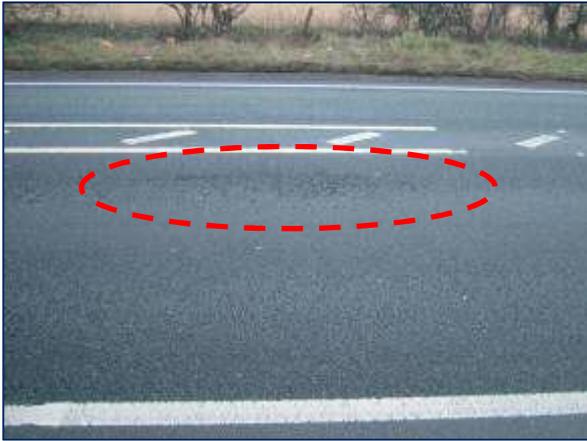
T crack in SB lane (Section 1900A5/171, ch. 0 m)
